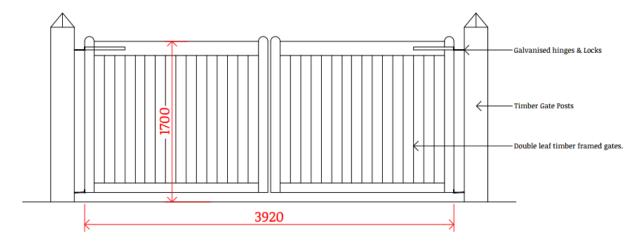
extract from gate elevation drawing (Source: Allan Curran Architecture, 2025).
